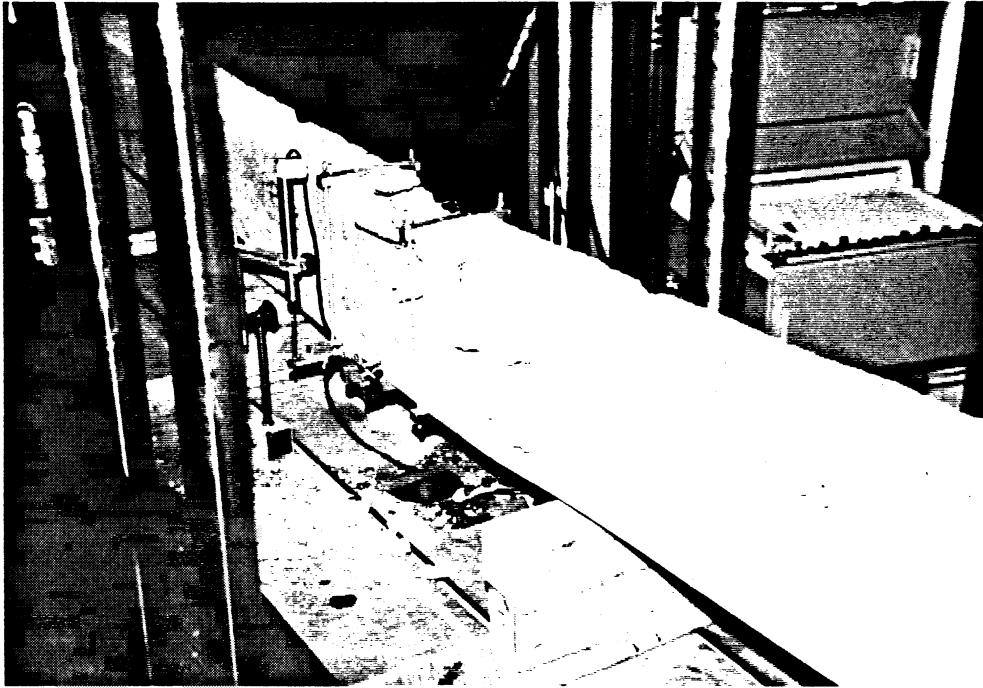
Typical Beam Failures: PP1D3, PP1S1
